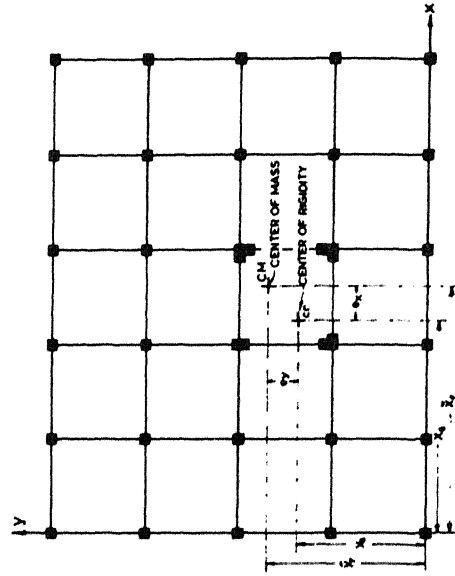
TYPICAL PLAN OF A STOREY IN A FRAMED BUILDING SUBJECTED TO TORSION
